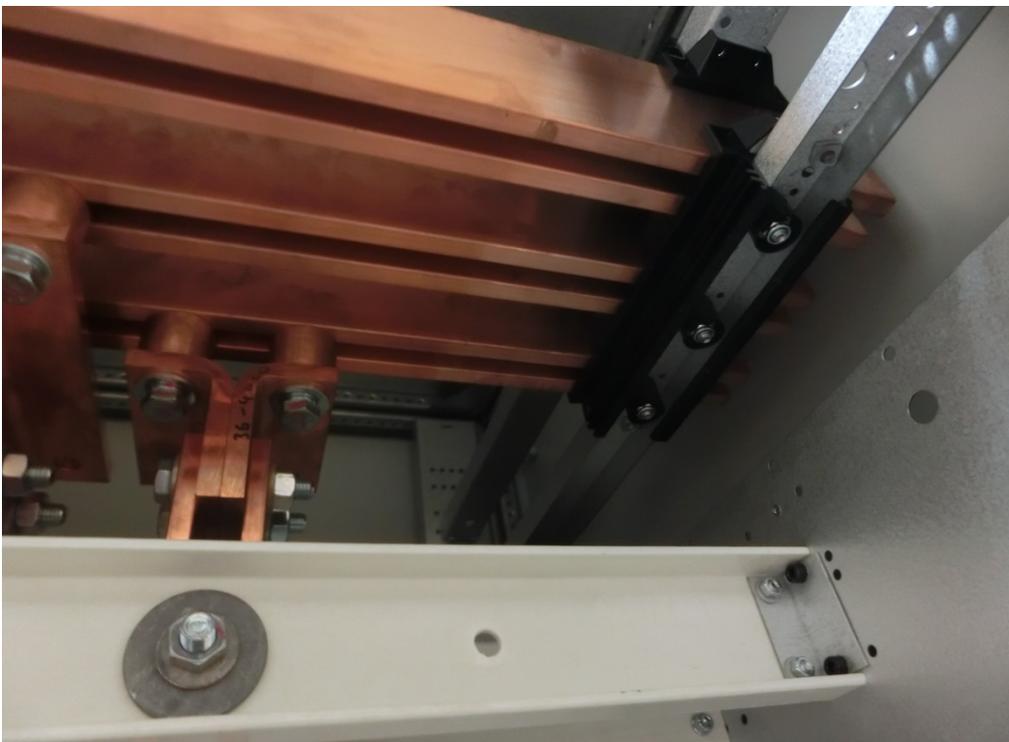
Visual Inspection: Large copper bars and mounting OK.
